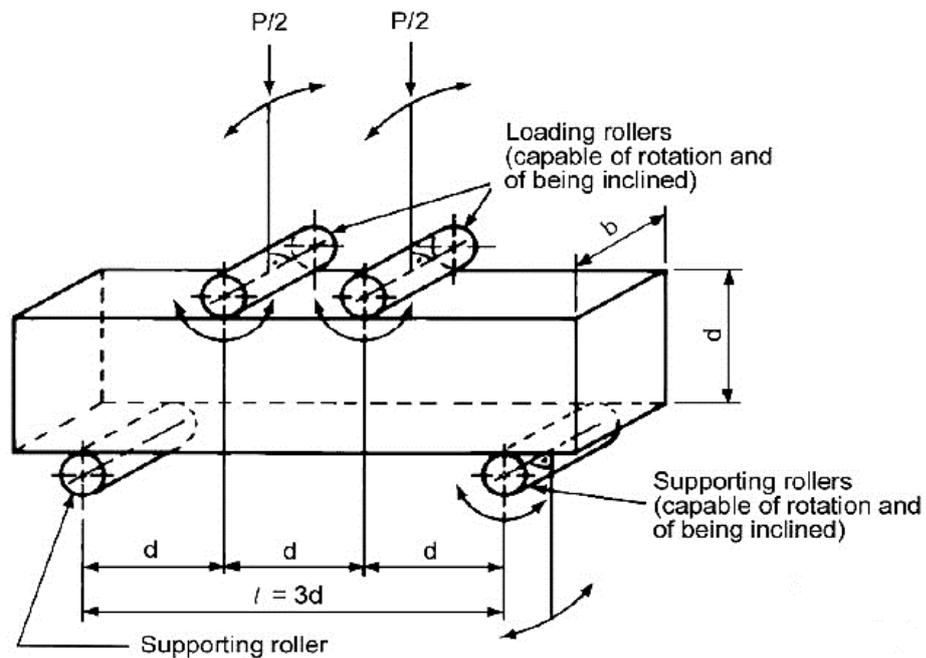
Arrangement of the flexural two-point load test (SANS 5864, 2006)
